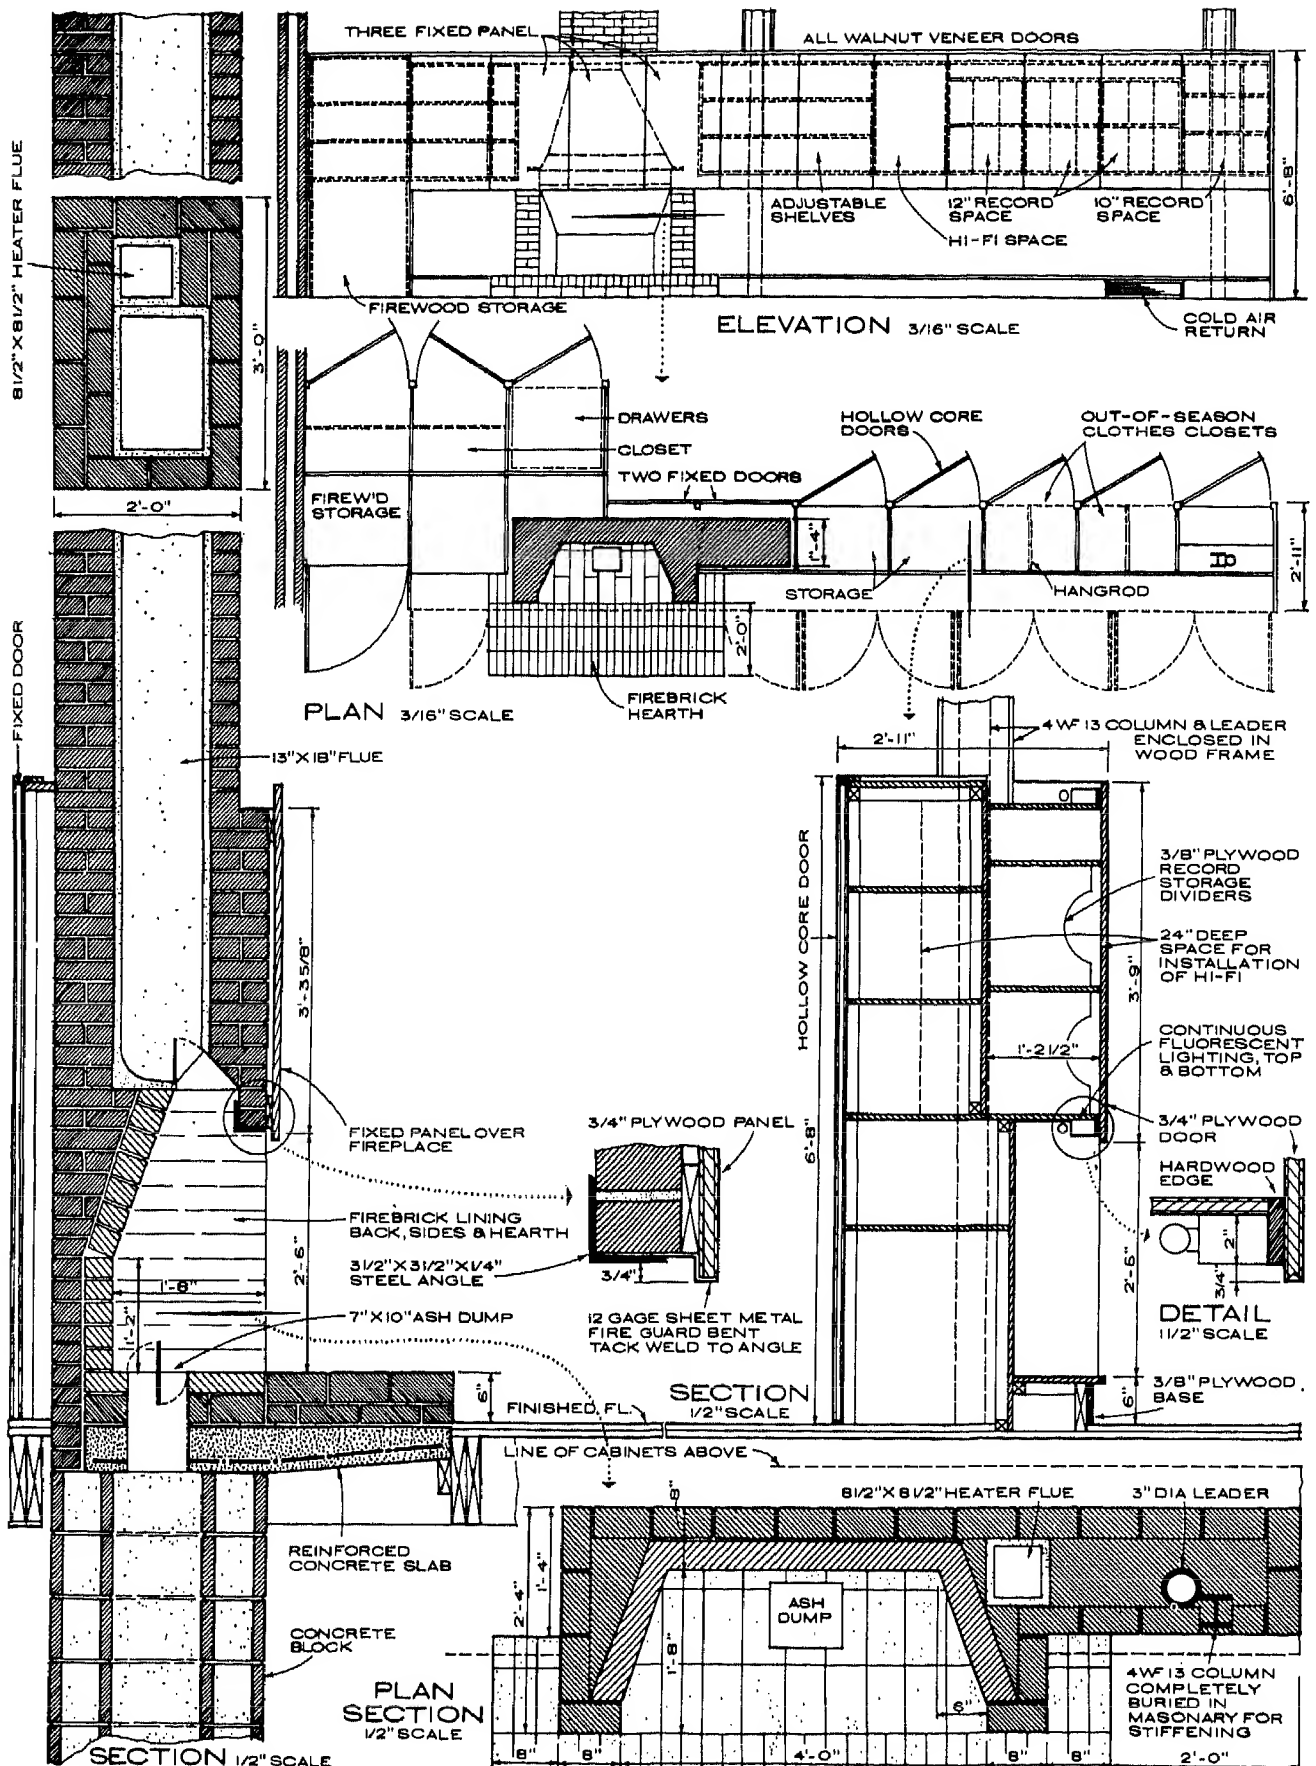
shows a plan and elevations of modifications to an existing fireplace. Based on these drawings and inspection and measurement of existing conditions, the contractor prepares and submits shop drawings for the designer's approval. Since at least two trades are involved, coordination of the trades by the contractor and a thorough
